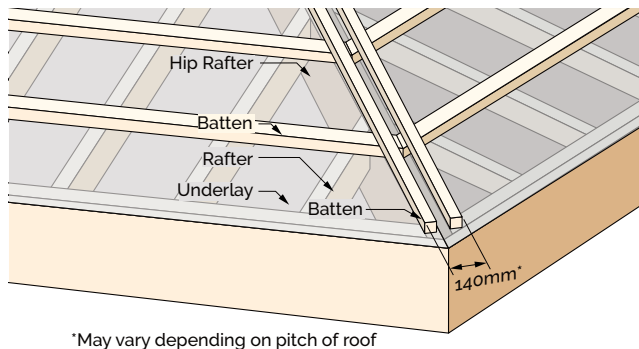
Accessory batten layout for Barrel 150
